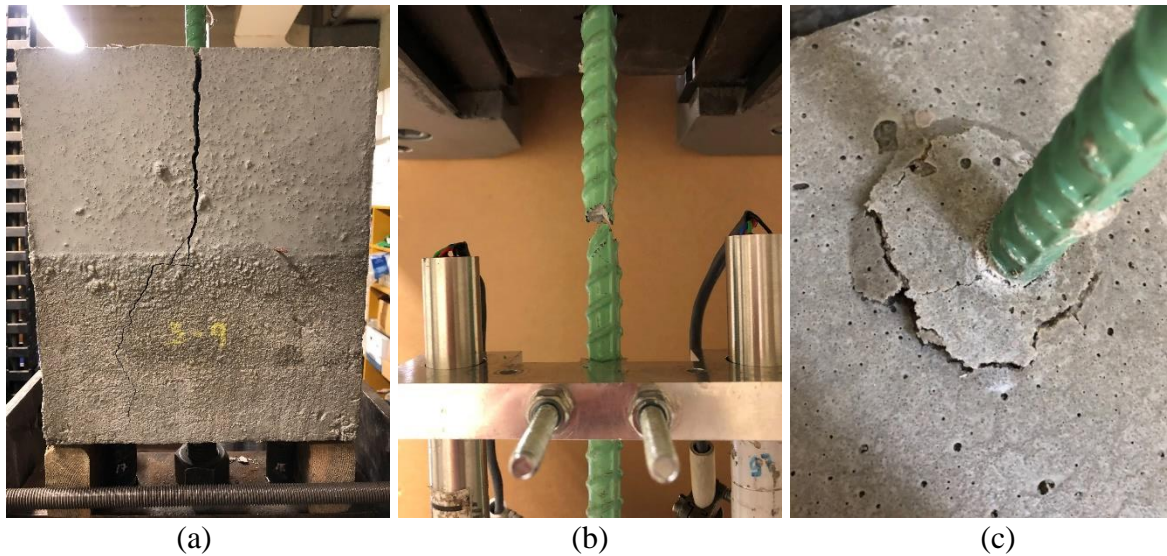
Observed failure modes of Task 3 specimens (a) splitting, (b) bar fracture, (c) pullout
